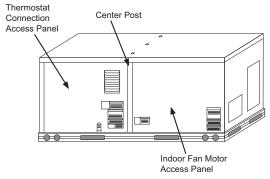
Typical Indoor Fan Motor Access Panel Locations
